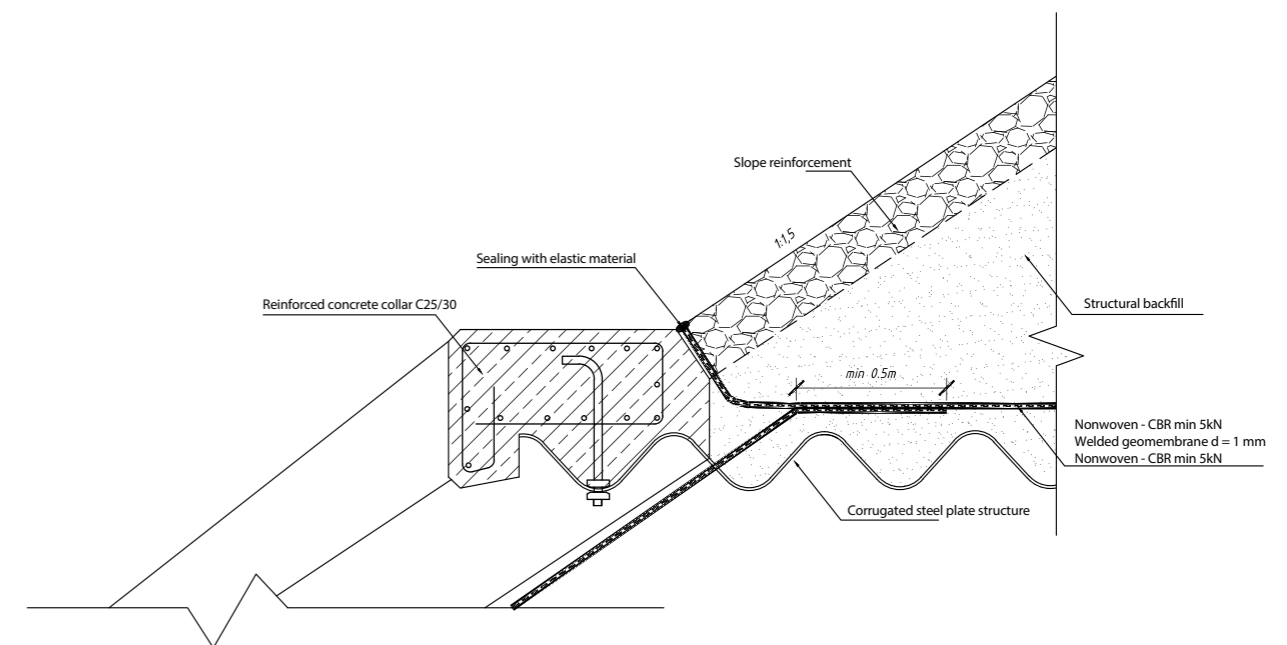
Example of a concrete collar on inlet and outlet of the structure
